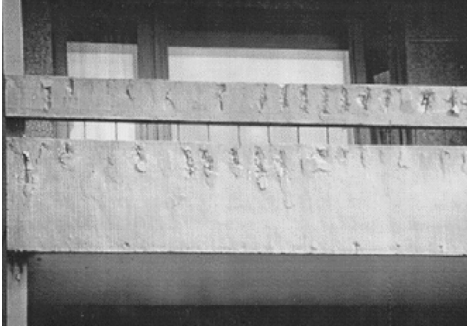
Corrosion of reinforcement is a common degradation mechanism in concrete facades and balconies.
